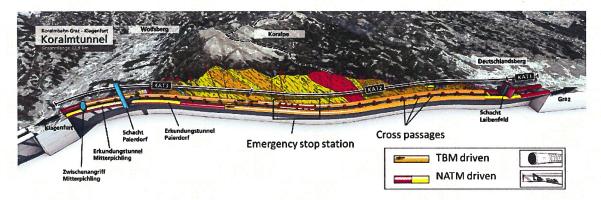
Sketch of the Koralm tunnel (source: ÖBB)
